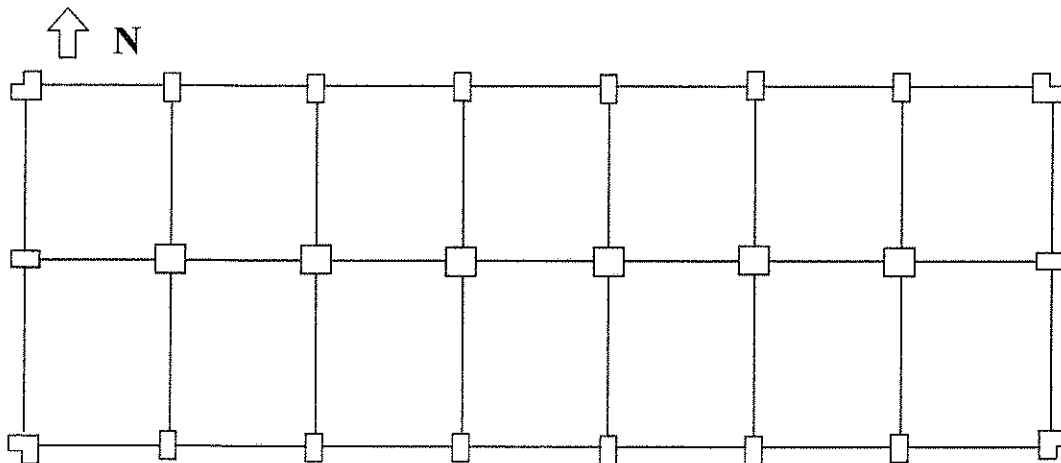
Columns In Typical Floor (2nd floor to roof)
